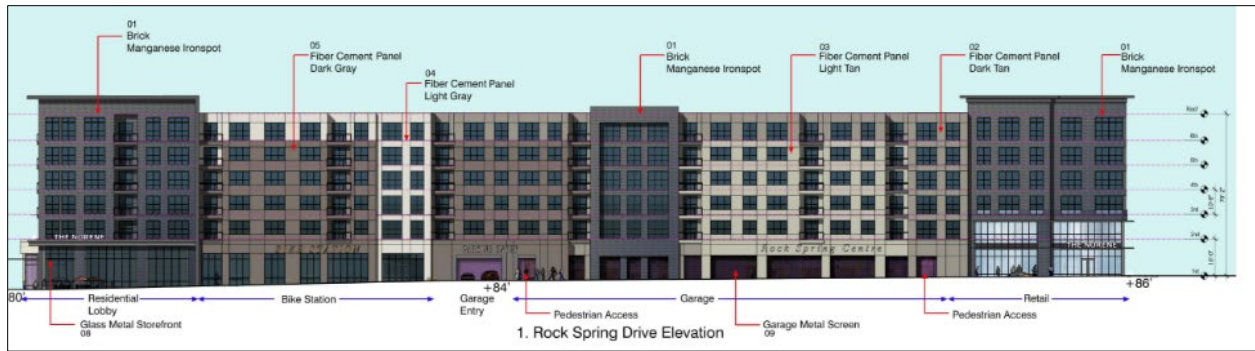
Parcel Q Building, Rock Spring Drive Elevation
